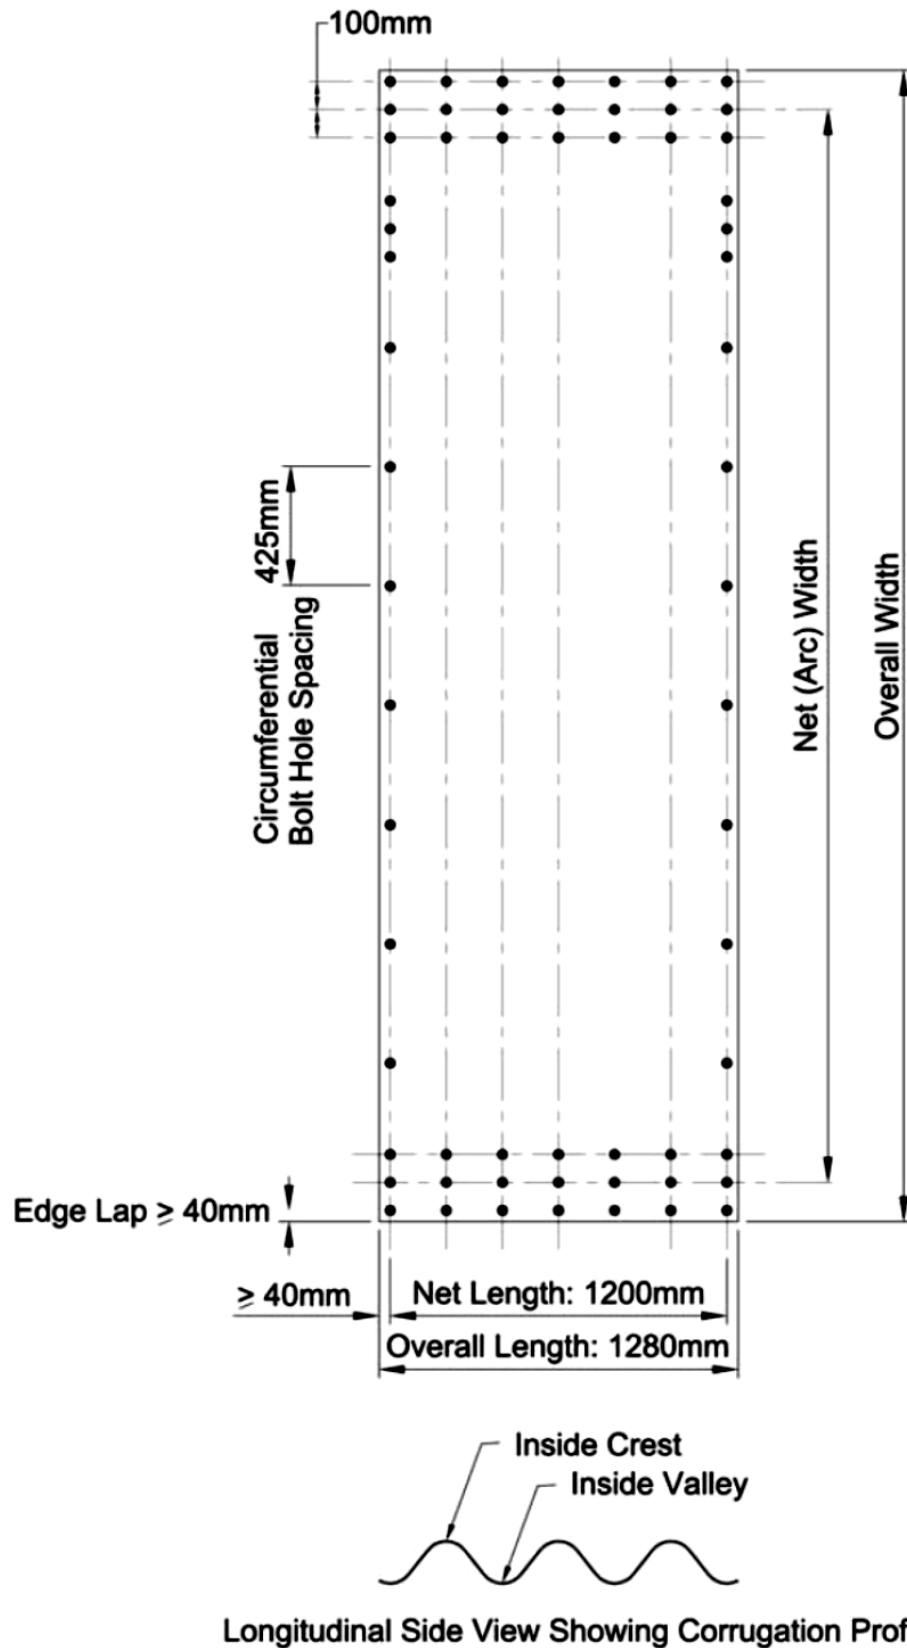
Deep Corrugated Structural Plate Type II plate configuration.^[6]
